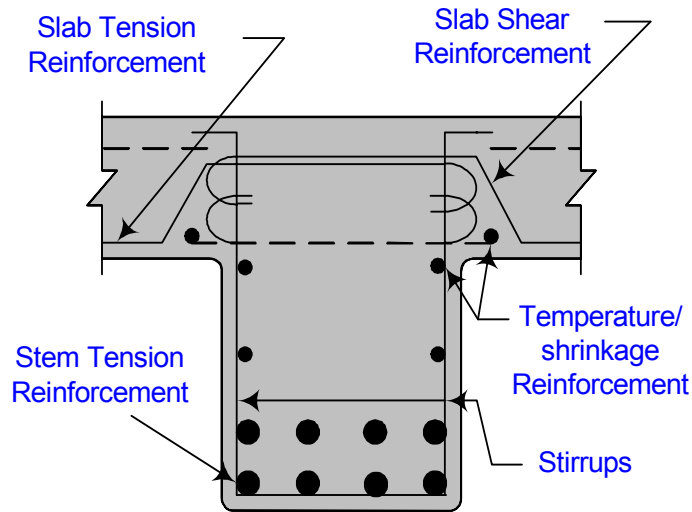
Steel Reinforcement in a Concrete Tee Beam
